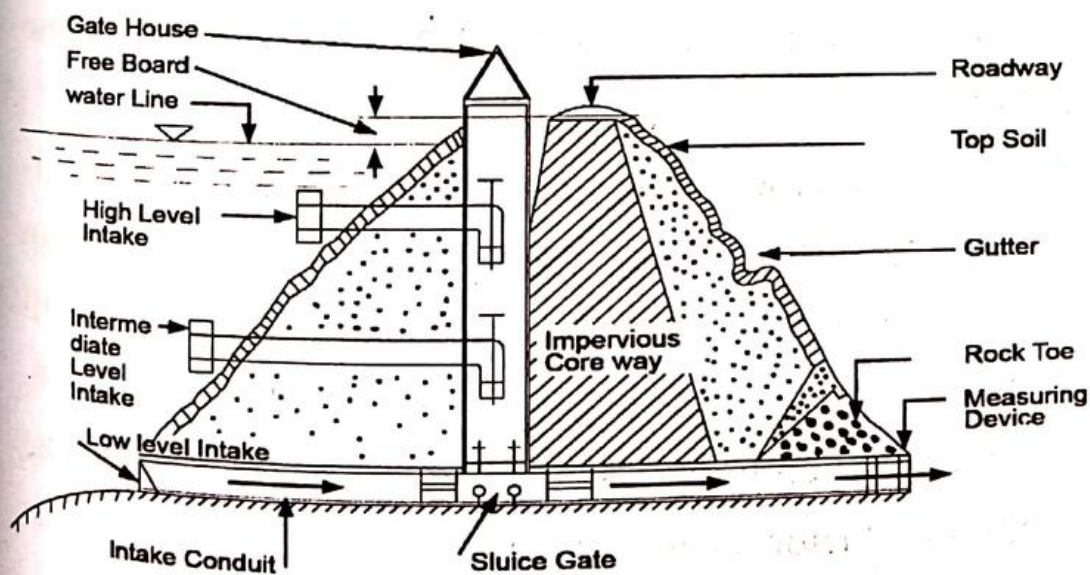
Dam and intake tower for an impounded Surface water Supply .
